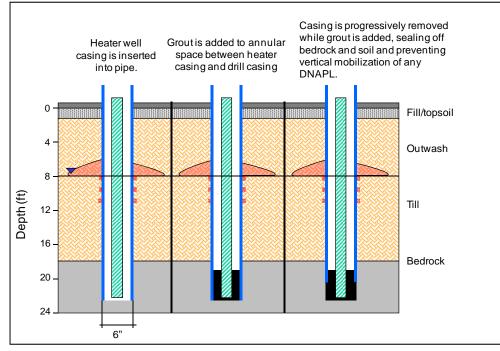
Setting of Thermal Well and Initial Grouting Process
